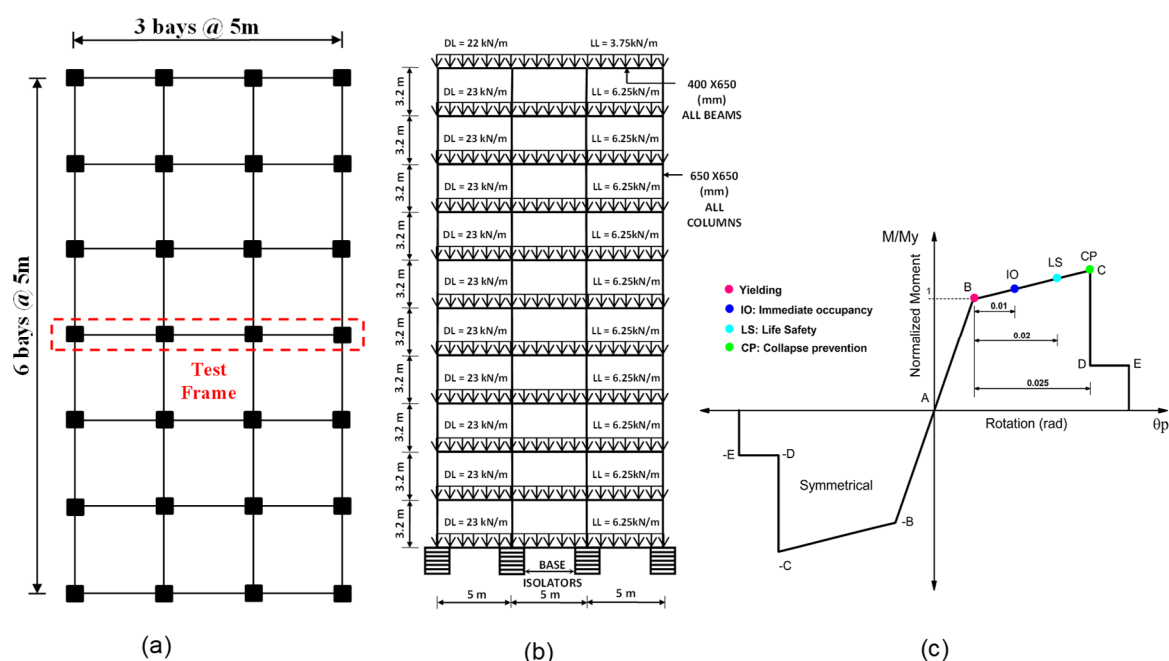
Details of building: (a) plan view; (b) elevation view of test frame; (c) typical moment-rotation curve of plastic hinge and acceptance criteria (IO, LS, and CP) as per FEMA-356
